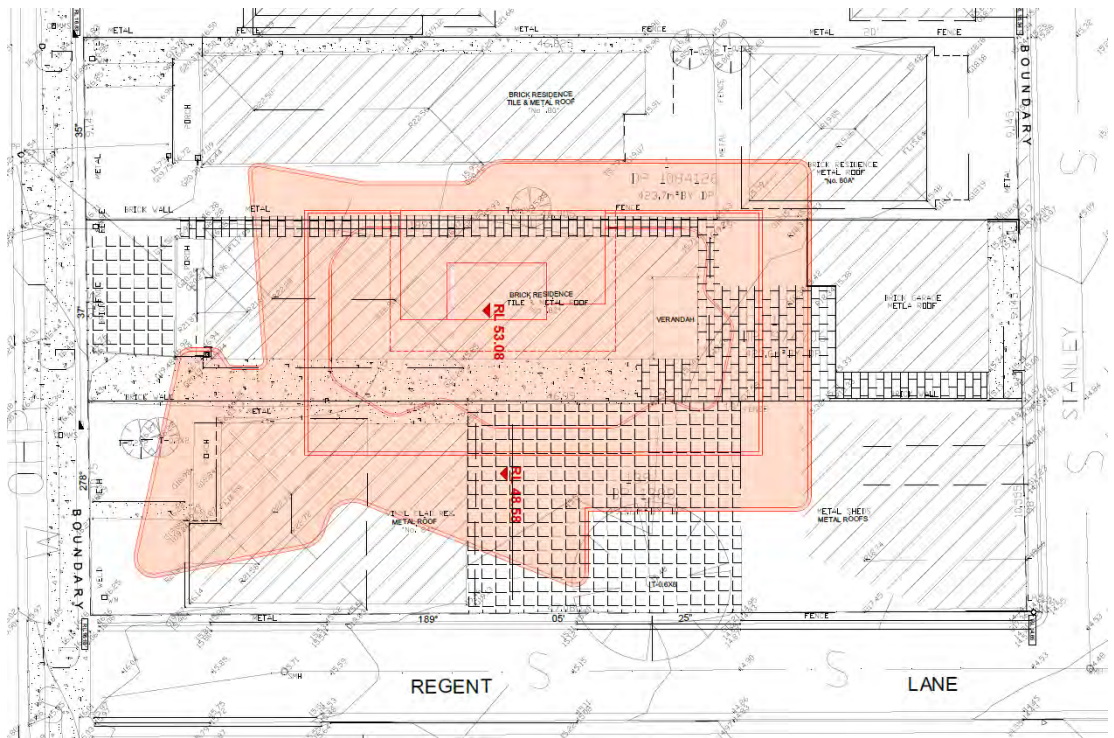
Roof plan superimposed on survey (Source: PBD Architects)
